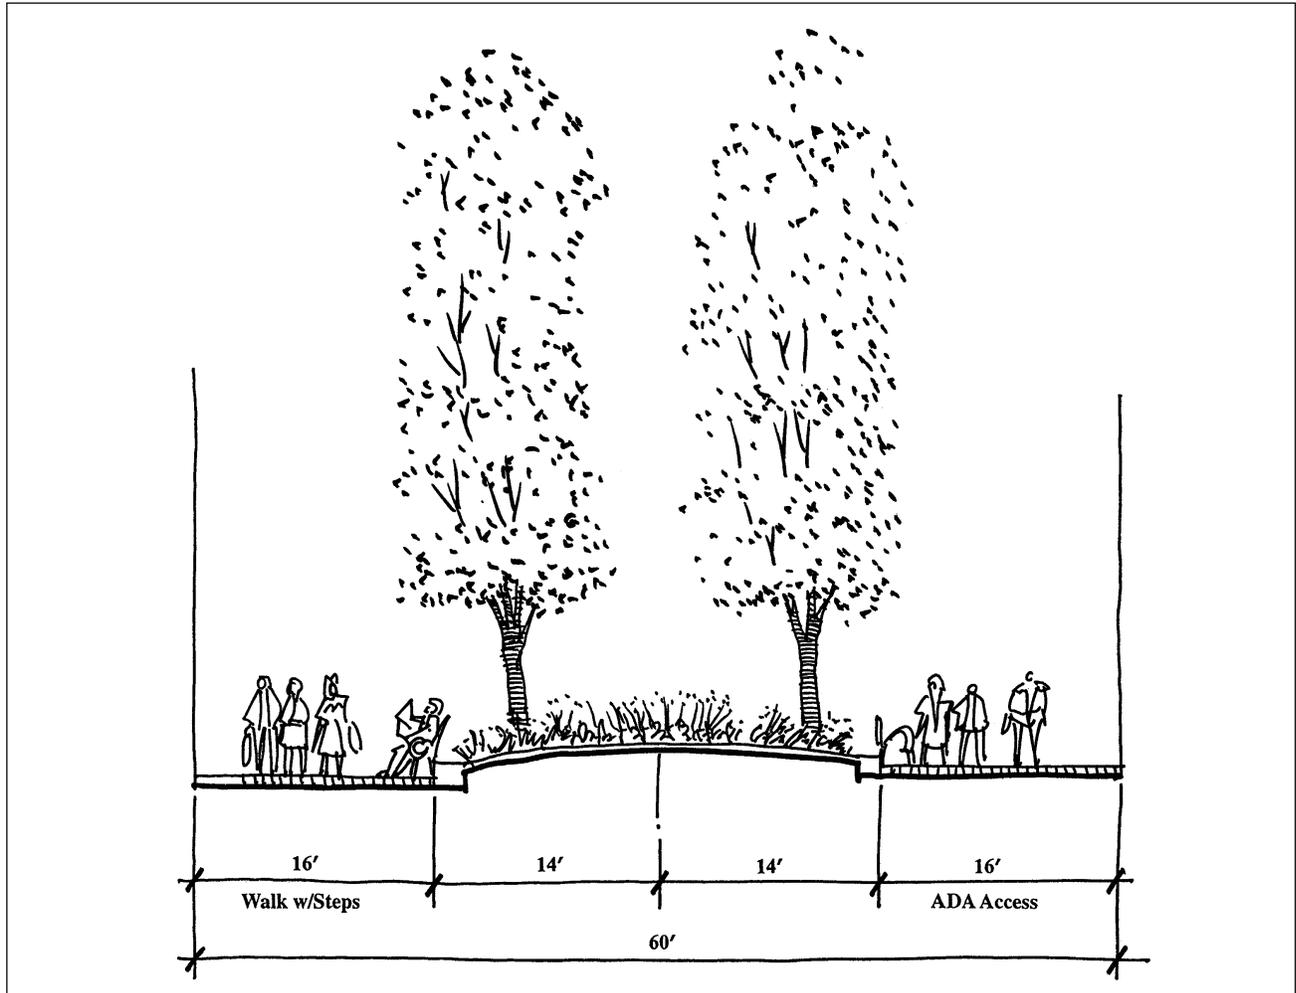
"Garden Hillclimb" Section; Full Boulevard Development – Flowers with Columnar Trees
